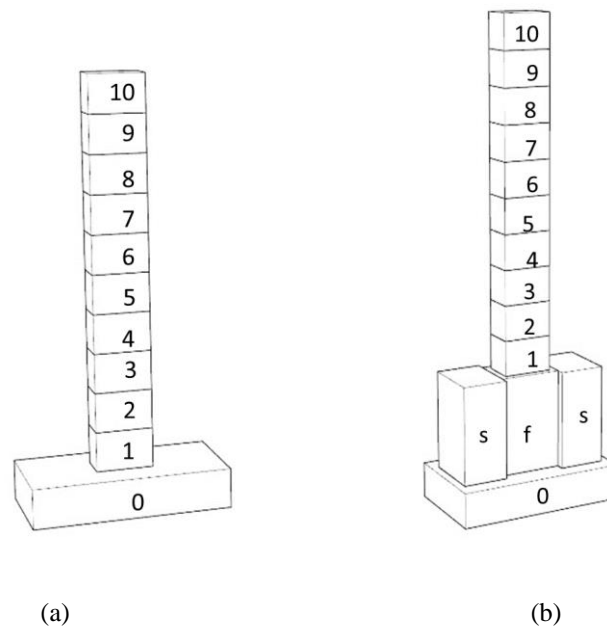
a) Column without the modelling of the foundation, b) Column and foundation
